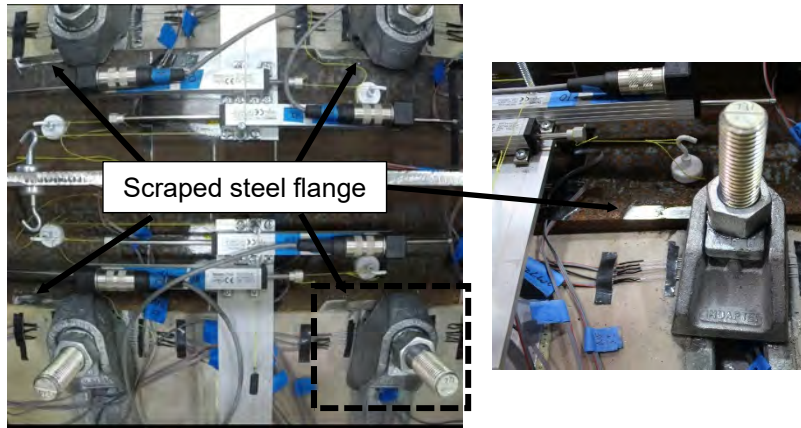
Damage of the steel flange in Test 6 at 1.28 in. (32.5 mm) slip
